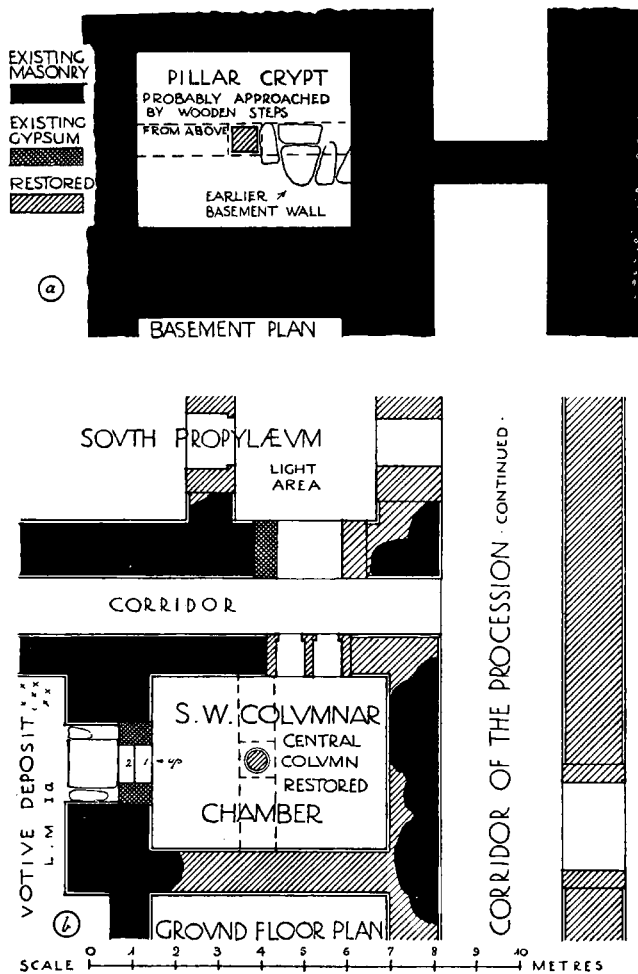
a*, GROUND PLAN OF S.W. COLUMNAR CHAMBER WITH ADJOINING SECTION; *b*, BASEMENT PLAN, SHOWING PILLAR CRYPT BENEATH.
